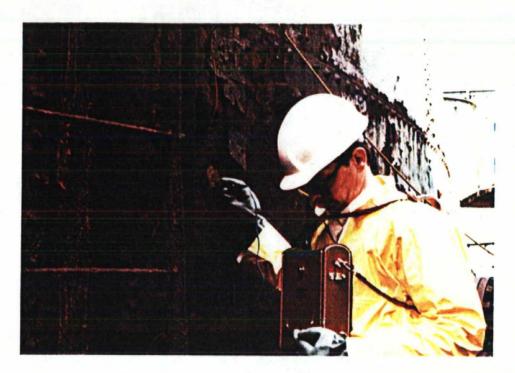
Measuring Thickness of Tank Wall. 5/9/85
